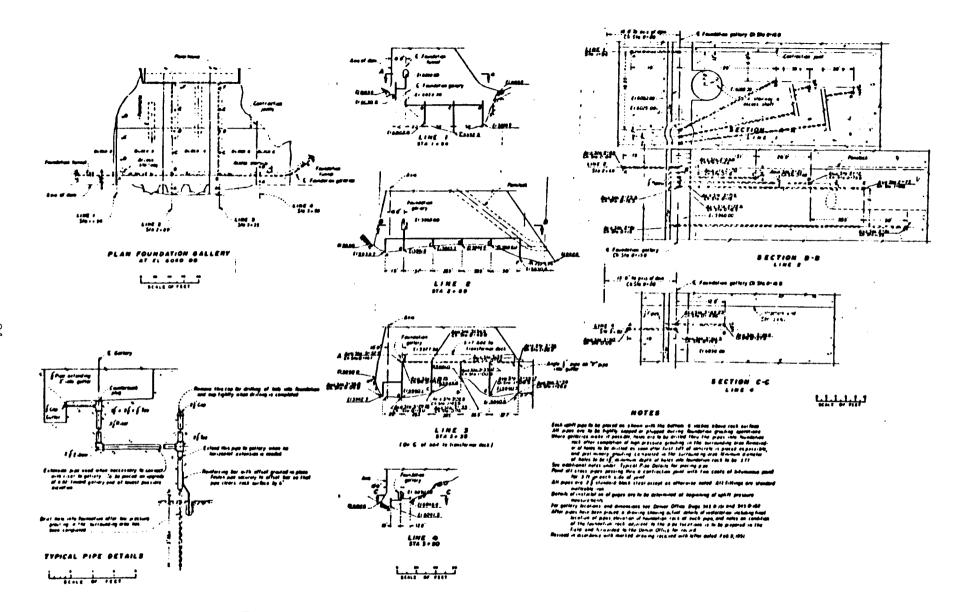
Foundation uplift pressure pipes in dam. From drawing 545-D-250.
